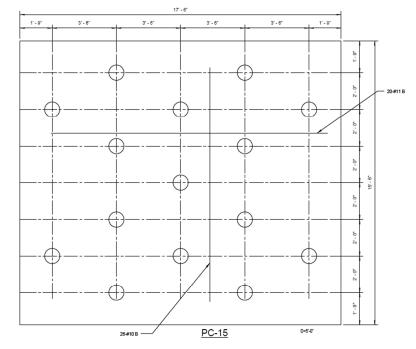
THIS IS PLAN OF A SAMPLE PILE CAP. DETAIL COURTESY OF TURNER CONSTRUCTION.
